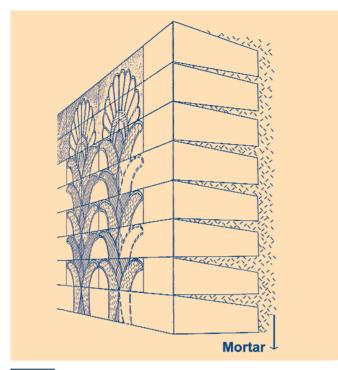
A section of a glazed brick frieze with a provided space for mortar; drawing by Sh. Razmjou.
